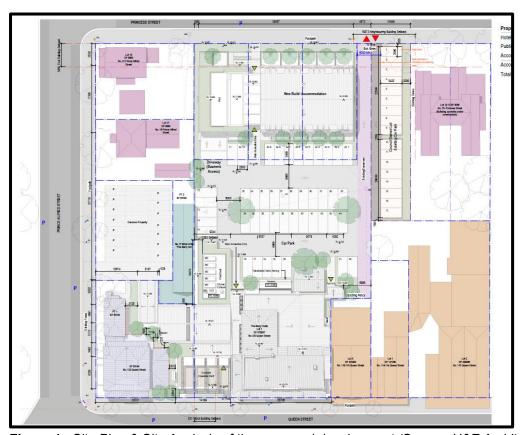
Site Plan & Site Analysis of the proposed development (Source: H&E Architects)
